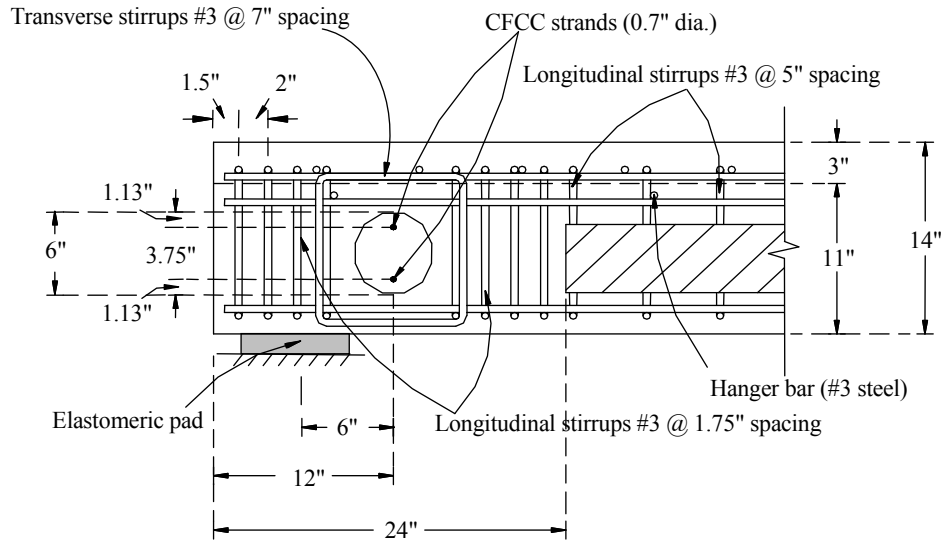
Cross-sectional details of the end diaphragm.
